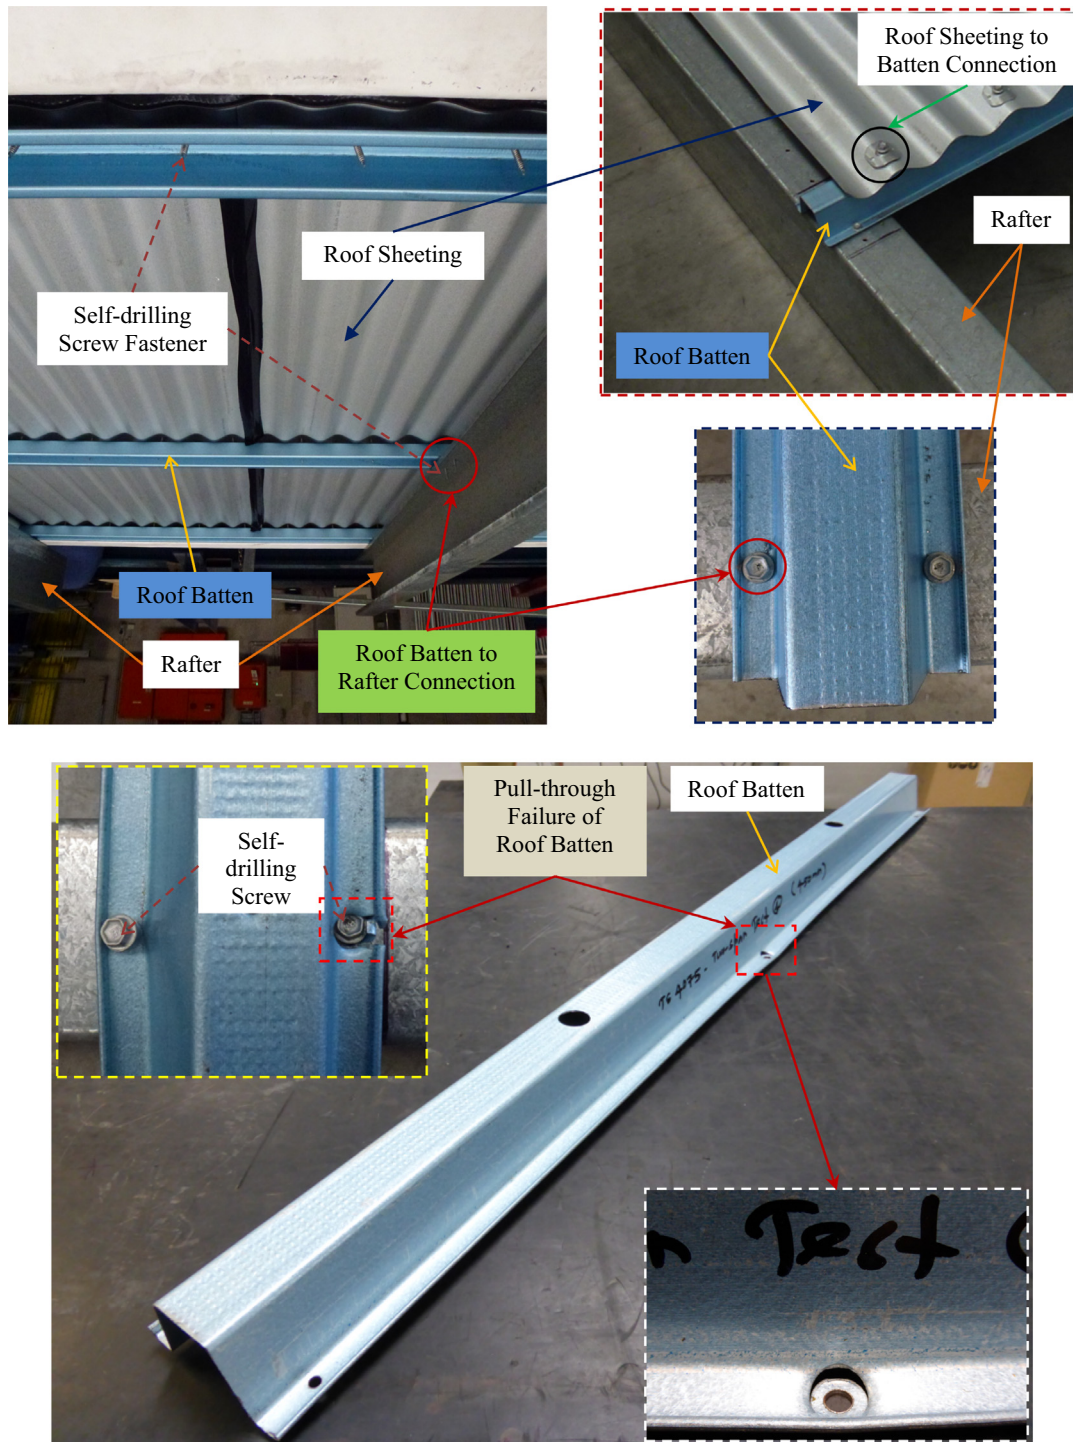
A typical roof batten to rafter connection and localised pull-through failure of thin steel roof batten.
